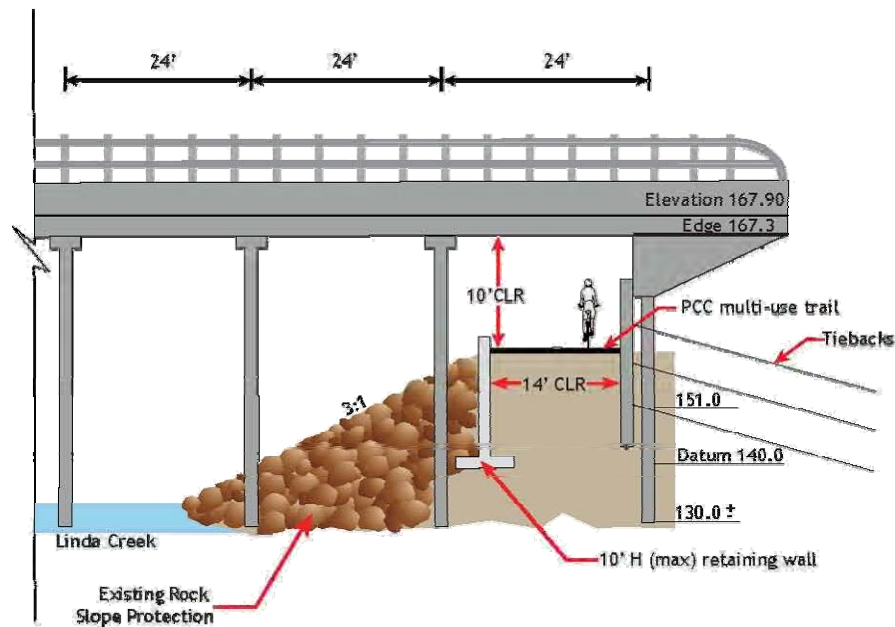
Old Auburn Road - Under-crossing Recommendation, looking upstream.
